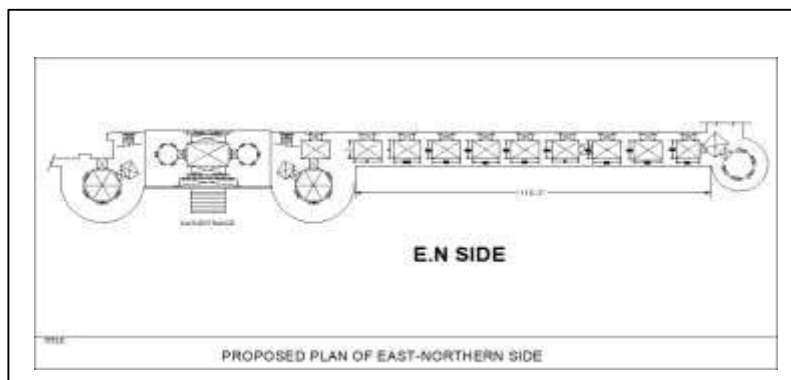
Proposed Plan of East Northern side of Rewat Fort (after Saeed, 2020, p. 49)
